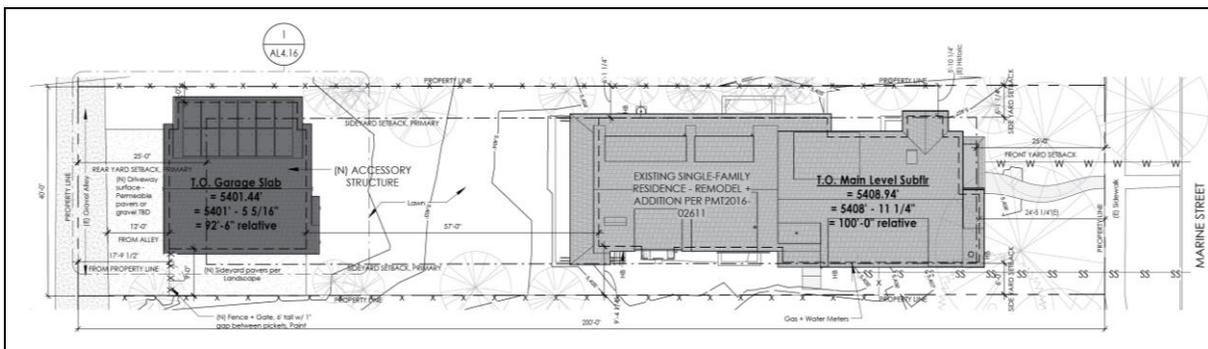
Proposed Site Plan, with footprint of house and approved rear addition (shaded).
